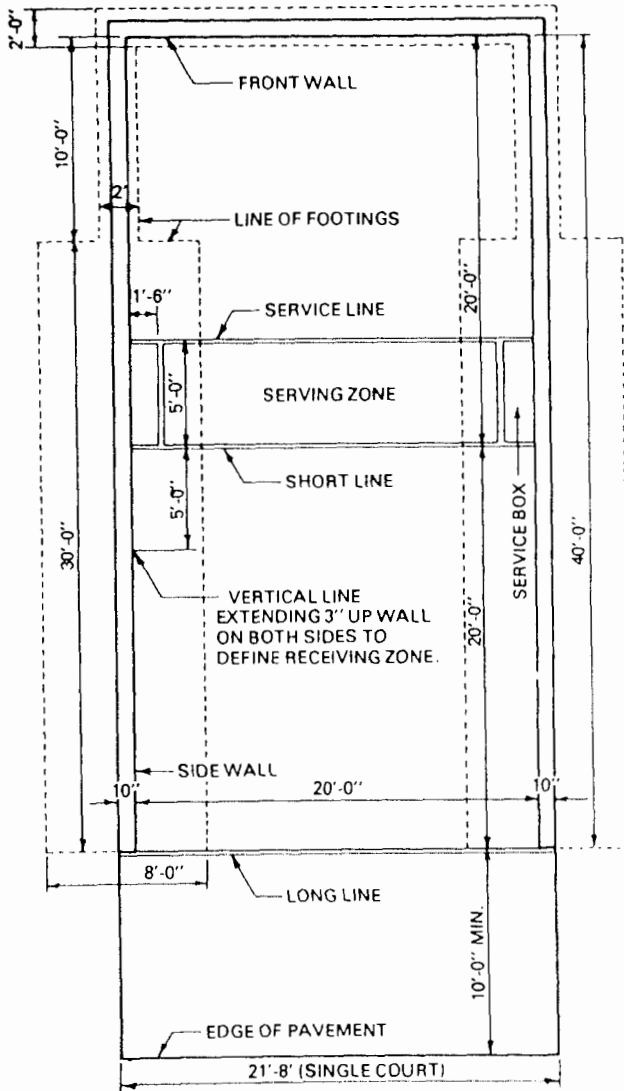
Handball court layout — four-wall. All court markings to be 1/2 in wide and painted white, red, or yellow.
